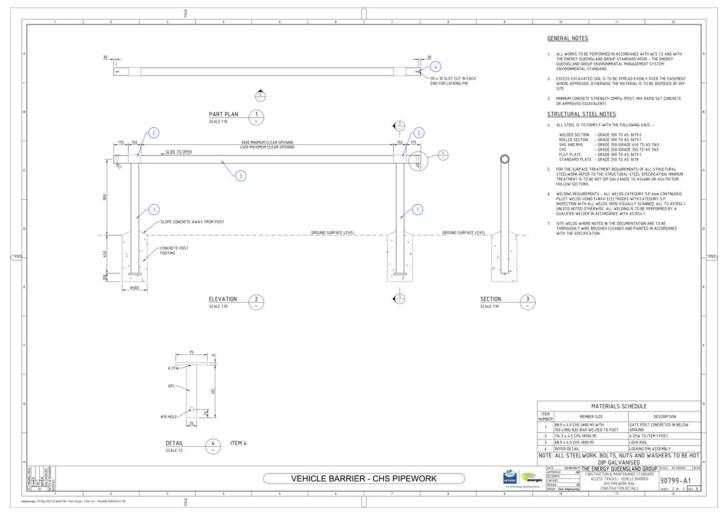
Access Track Infrastructure – Fencing Locking Rail – CHS Pipework Rail Barrier Details.
